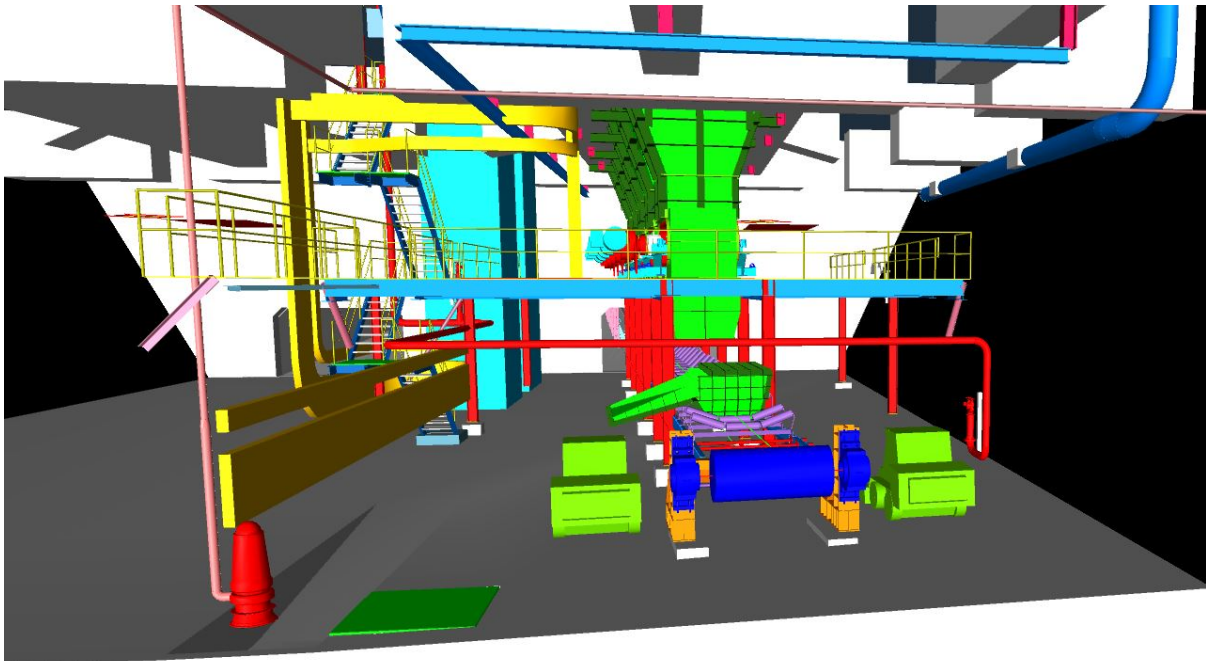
Apron Feeder Level Structural Steel Floor – Rear View 2
